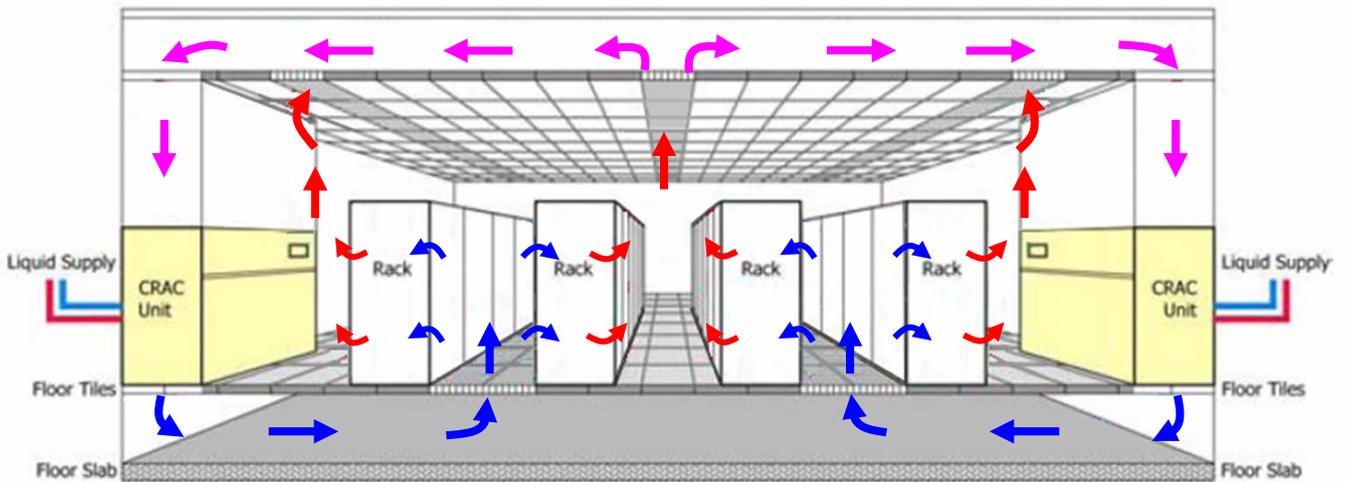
Raised floor implementation using a dropped ceiling as a hot air return plenum.
